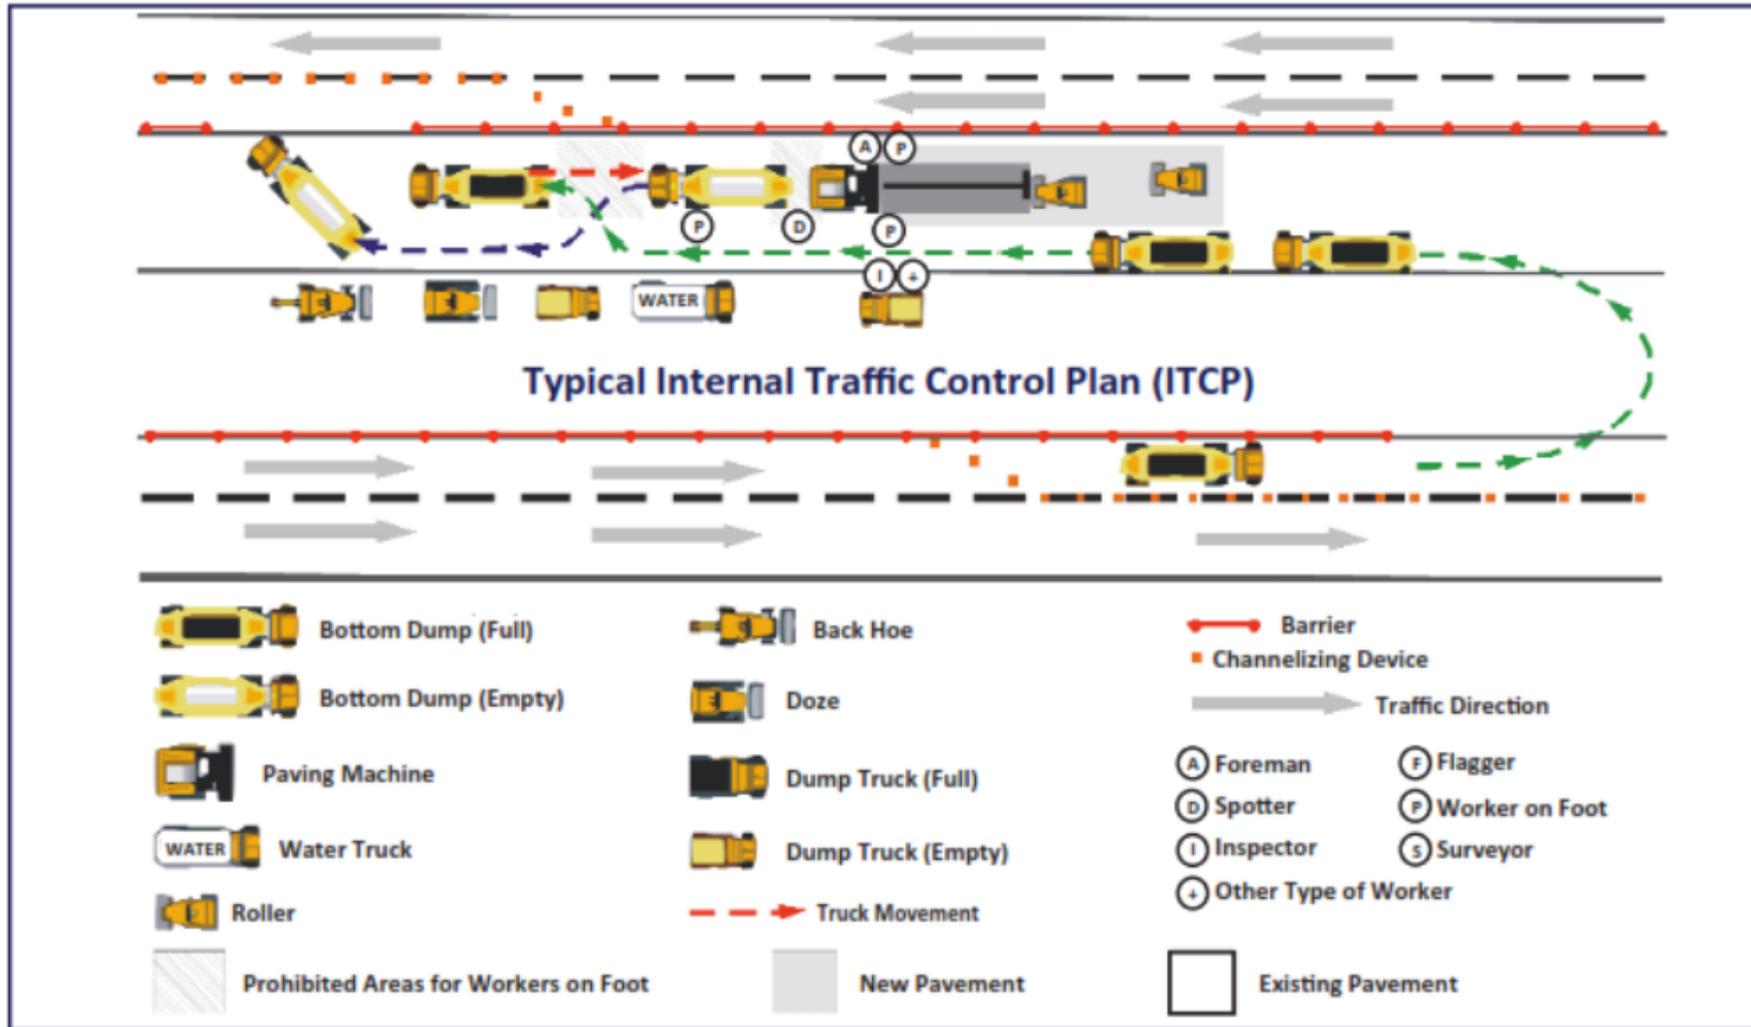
Typical Internal Traffic Control Plan (ITCP) (FHWA, 2007)
